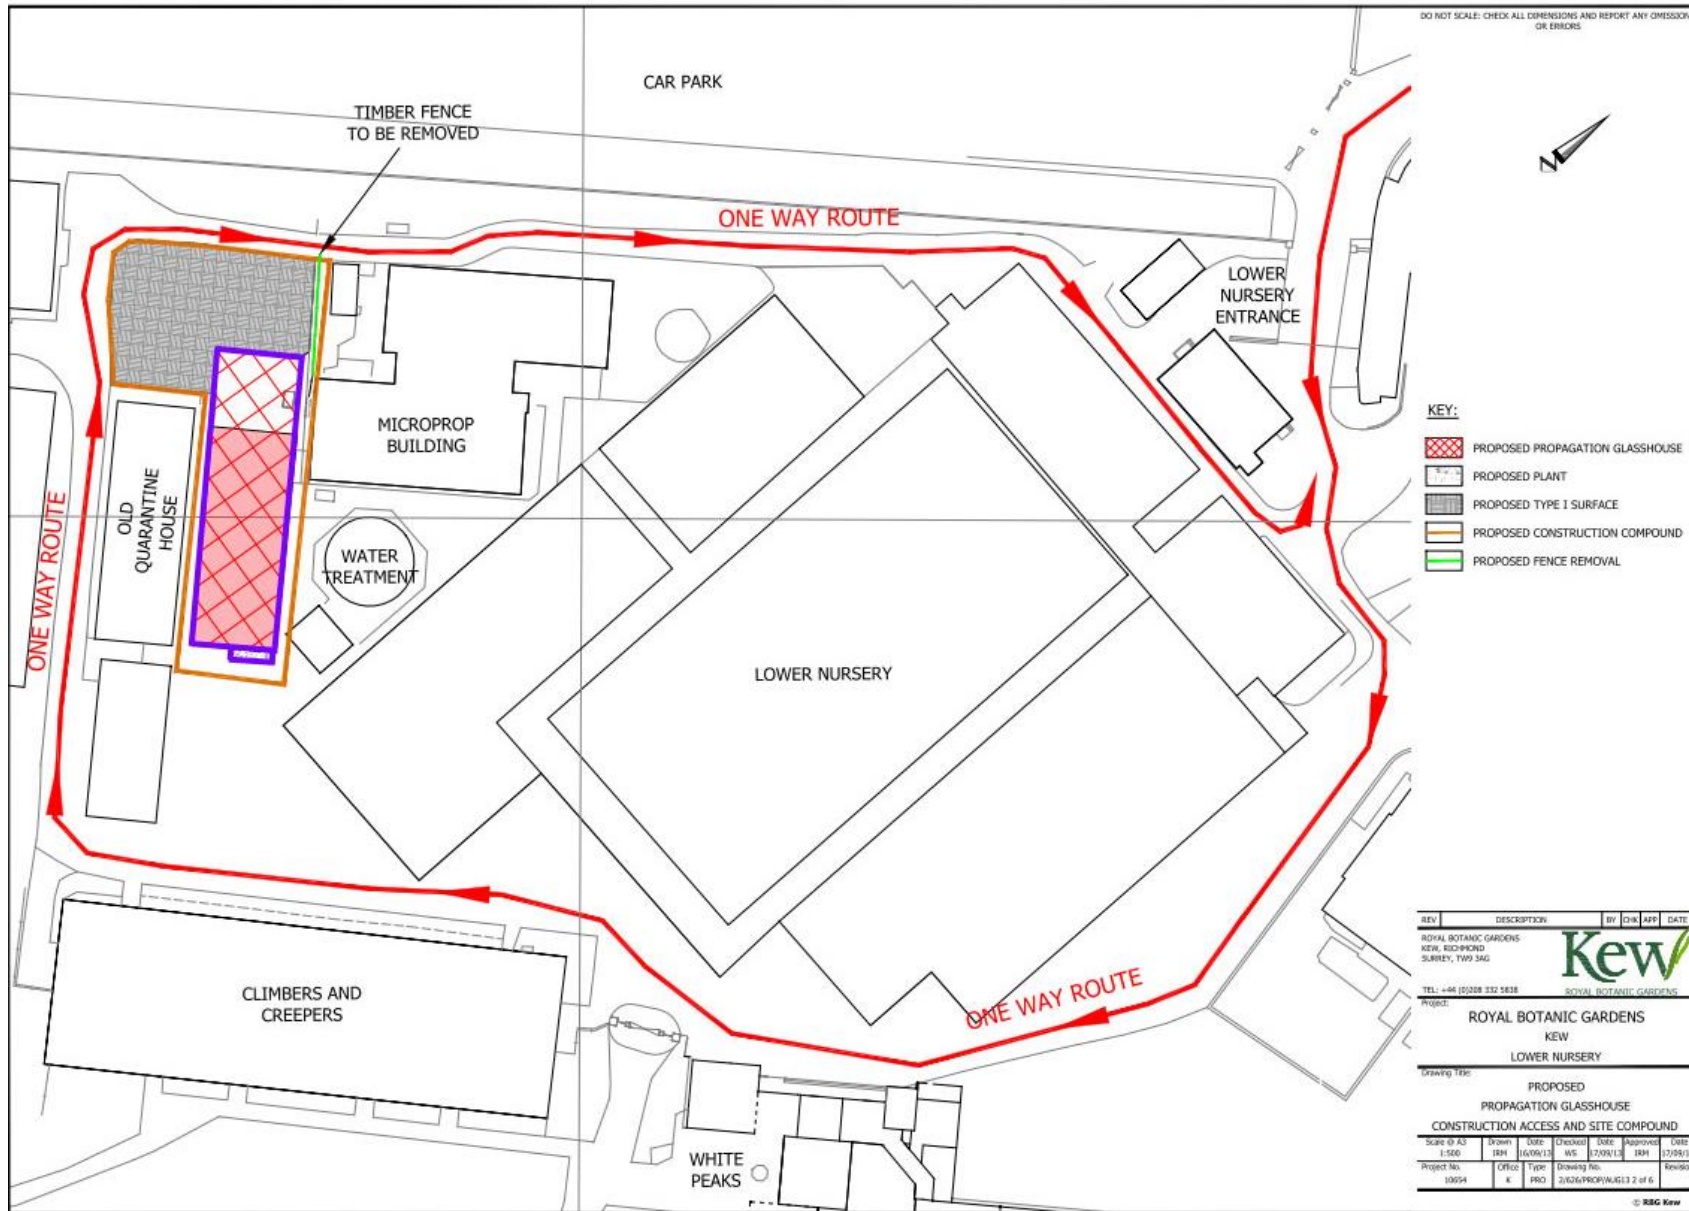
Detailed plan of the watching brief site, with the proposed glasshouse outlined in blue and the existing polytunnel shaded in red, and the hard standing area shaded in grey
